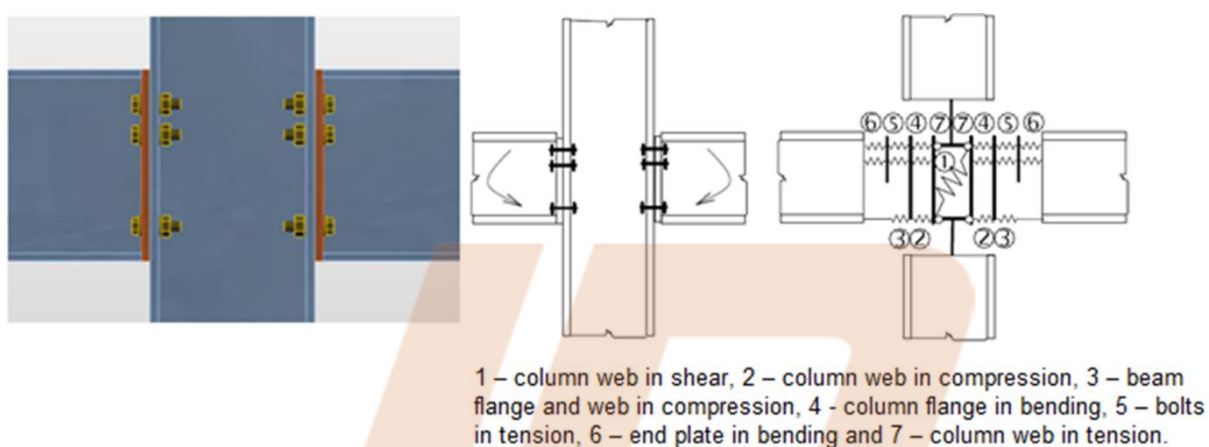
The components of a joint with bolted end plates modeled by springs.
